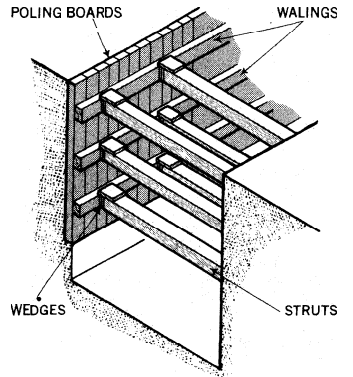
TIMBERSHORING FOR EXCAVATION
